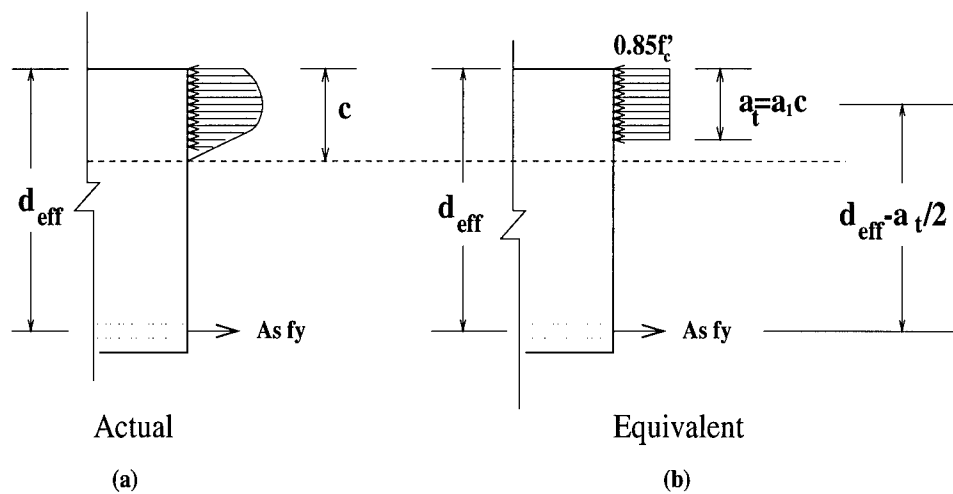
(a) Actual and (b) Equivalent Approximation for Stress on Cross Section of Concrete Slab
